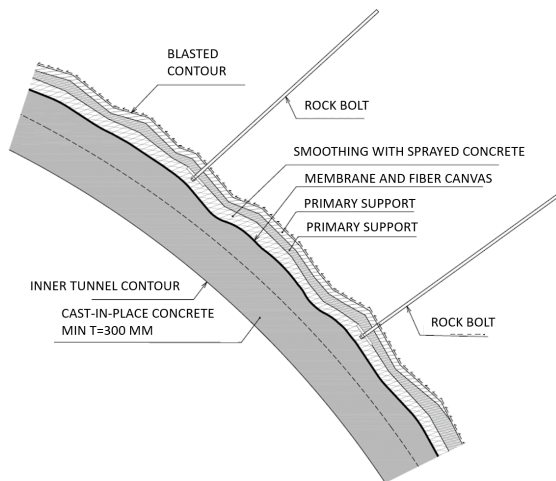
Bounded tunnel lining, cast-in-place concrete structure with sheet membrane, reworked (Bane NOR, 2018a).
